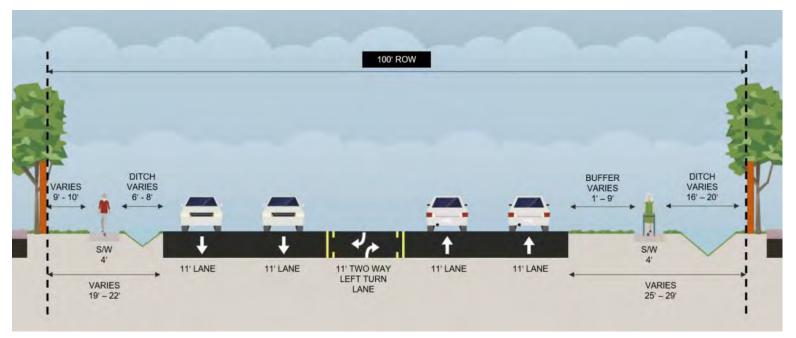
B Existing Typical Section: Memorial Drive - Paul Revere Dr to Frostwood Dr N.T.S.
